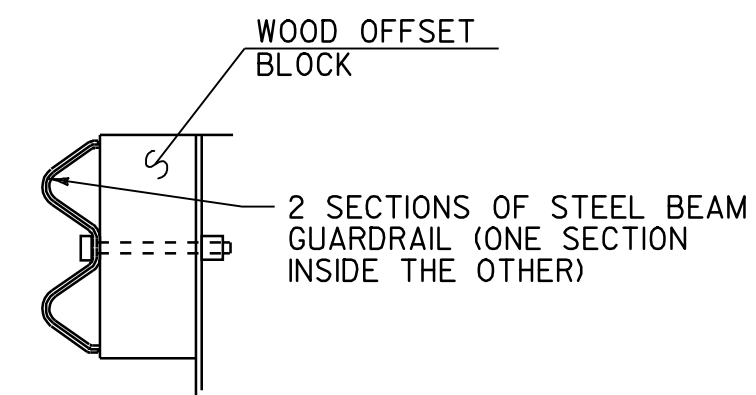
DETAIL OF STEEL BEAM GUARDRAIL AT SMALL CULVERTS AND BRIDGES
